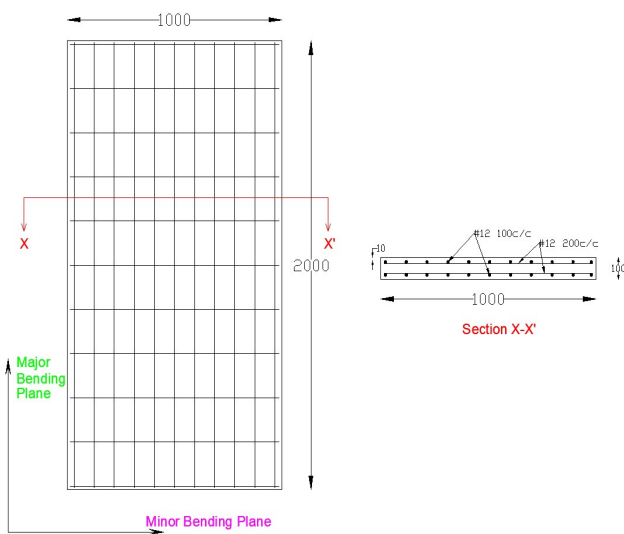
Dimensions (mm) and reinforcement details of the slabs tested by Wu C. et al. (2009) [38]
